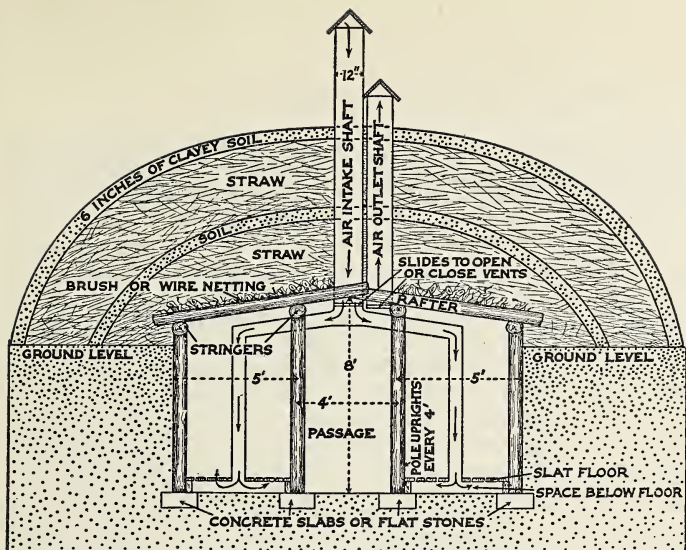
An outdoor vegetable storage room. The excavation can be made in a bank to great advantage. The rafters must be strong and well supported. (Drawing from Extension Department, University of Saskatchewan)
